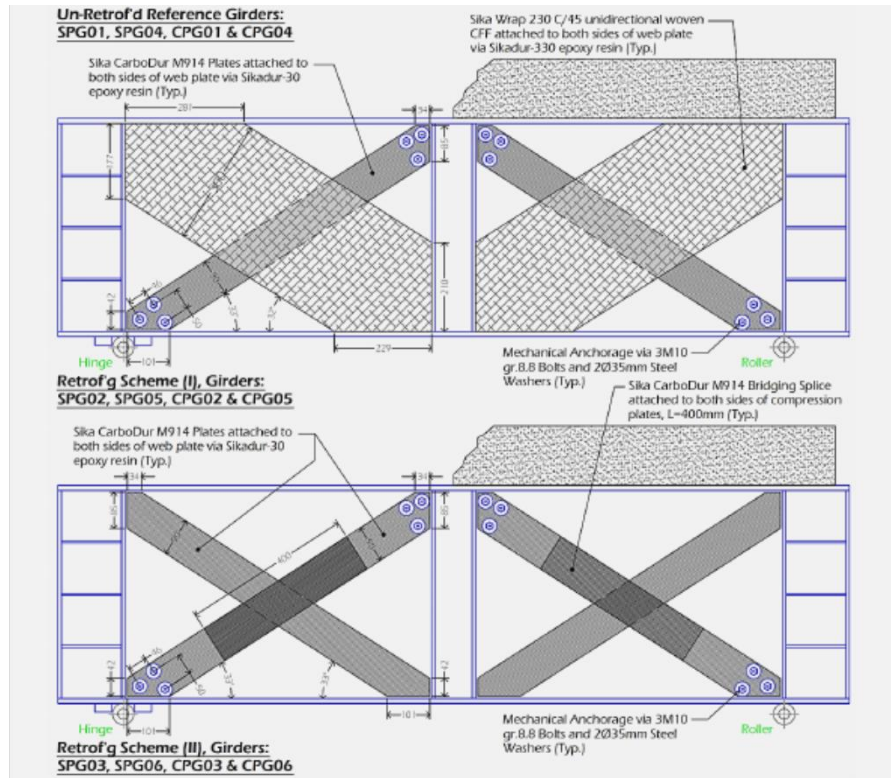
Details of retrofitting schemes, (Assoodani, 2014).
